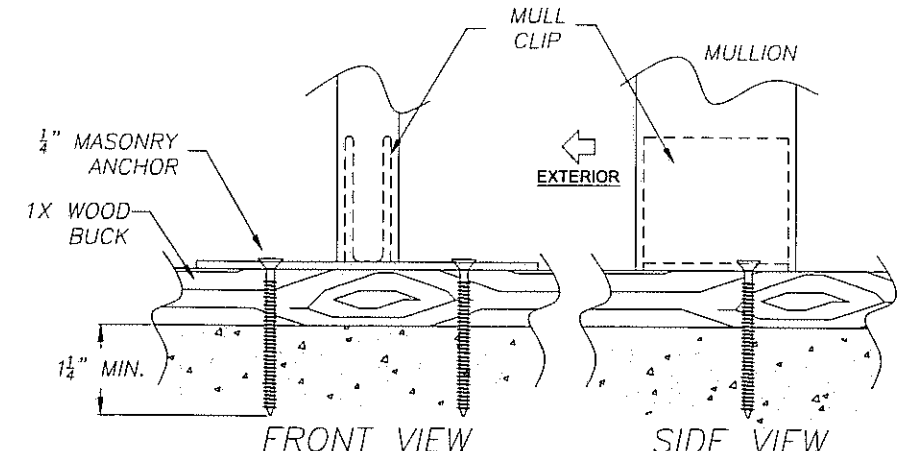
MULLION CLIP TO CONCRETE STRUCTURE
